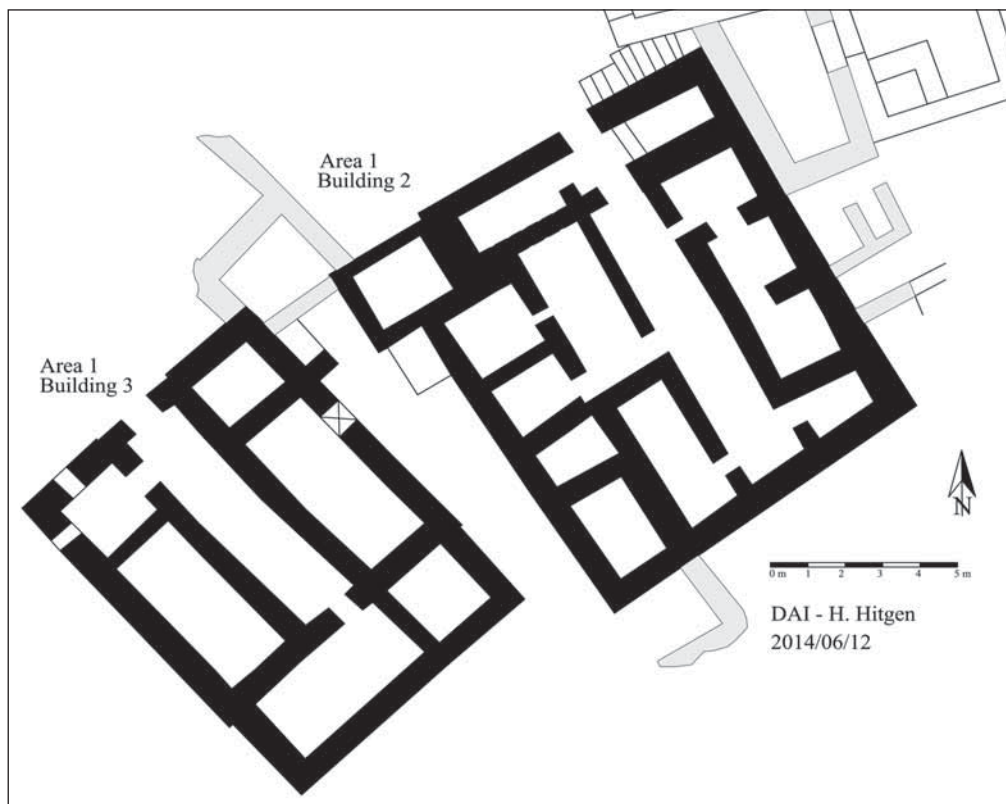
Ġabal al-'Awd, area 1. Schematic ground plan of the houses 2 and 3 (© DAI, H. Hitgen)
